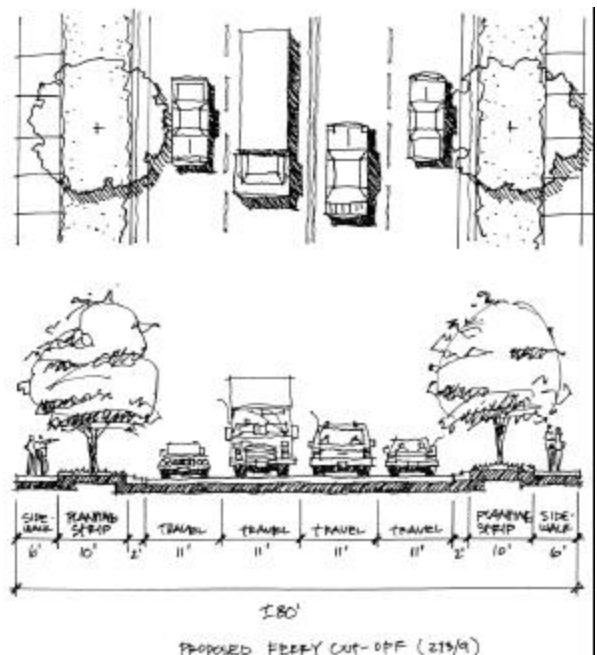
Potential cross section of Ferry cut-off (Route 9)
